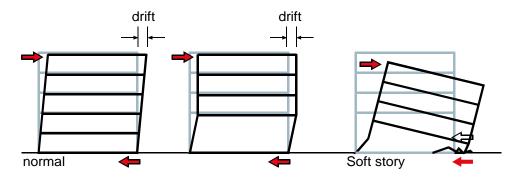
(a) Soft Storey due to Excessive Floor Height in Ground Storey
